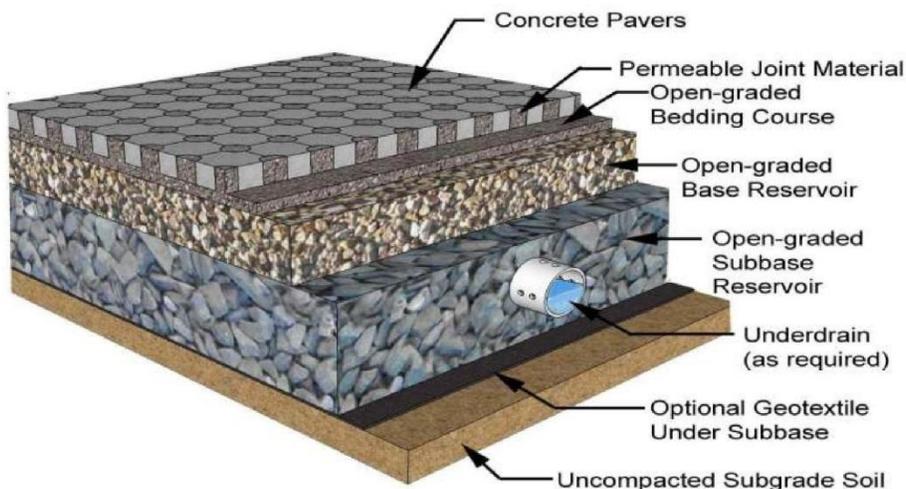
Typical Detail of Concrete Paver (Source: Smith, 2009)
